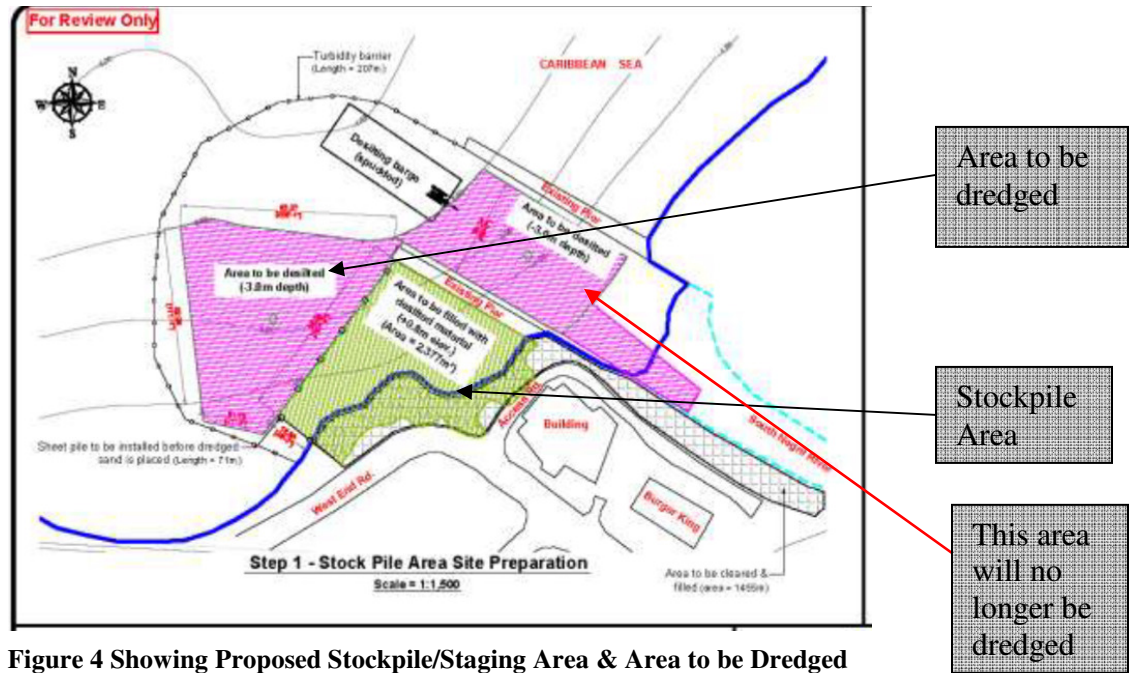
Showing Proposed Stockpile/Staging Area & Area to be Dredged
